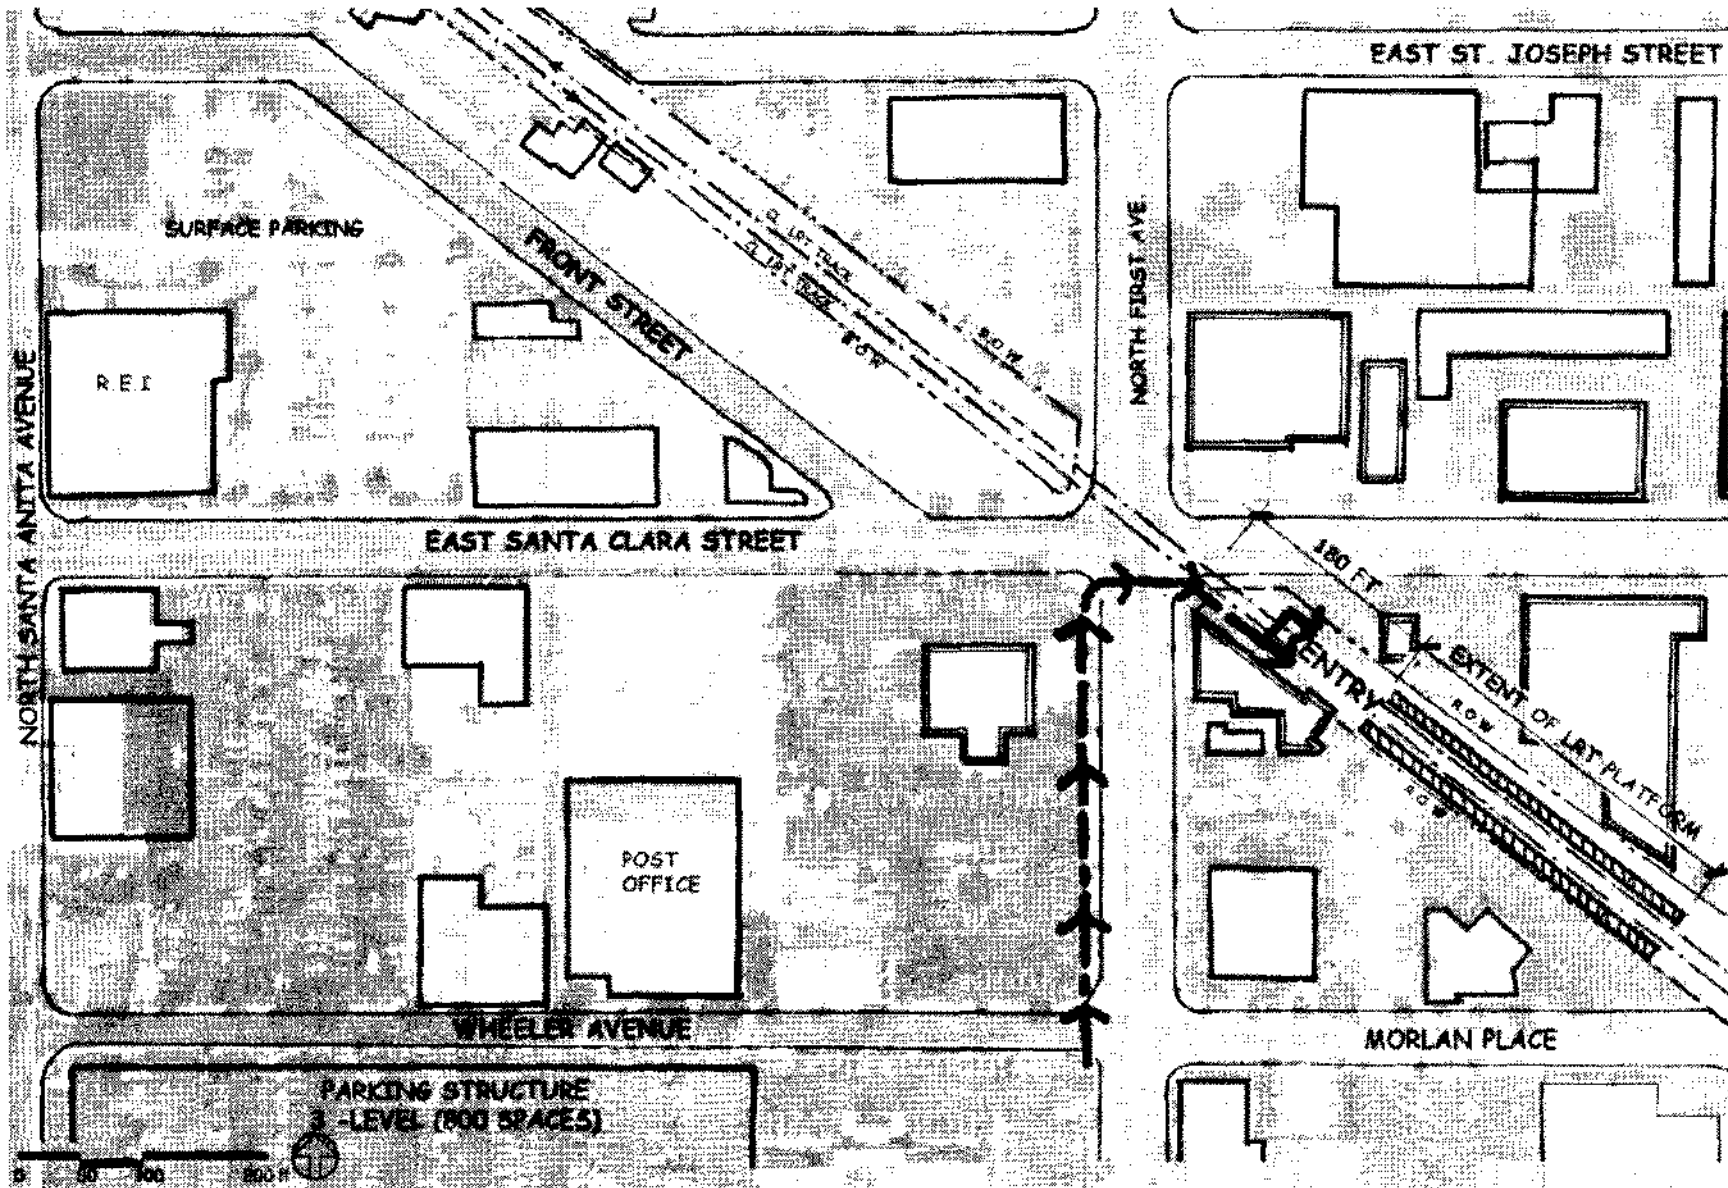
Site Plan: City of Arcadia Station, Option A
